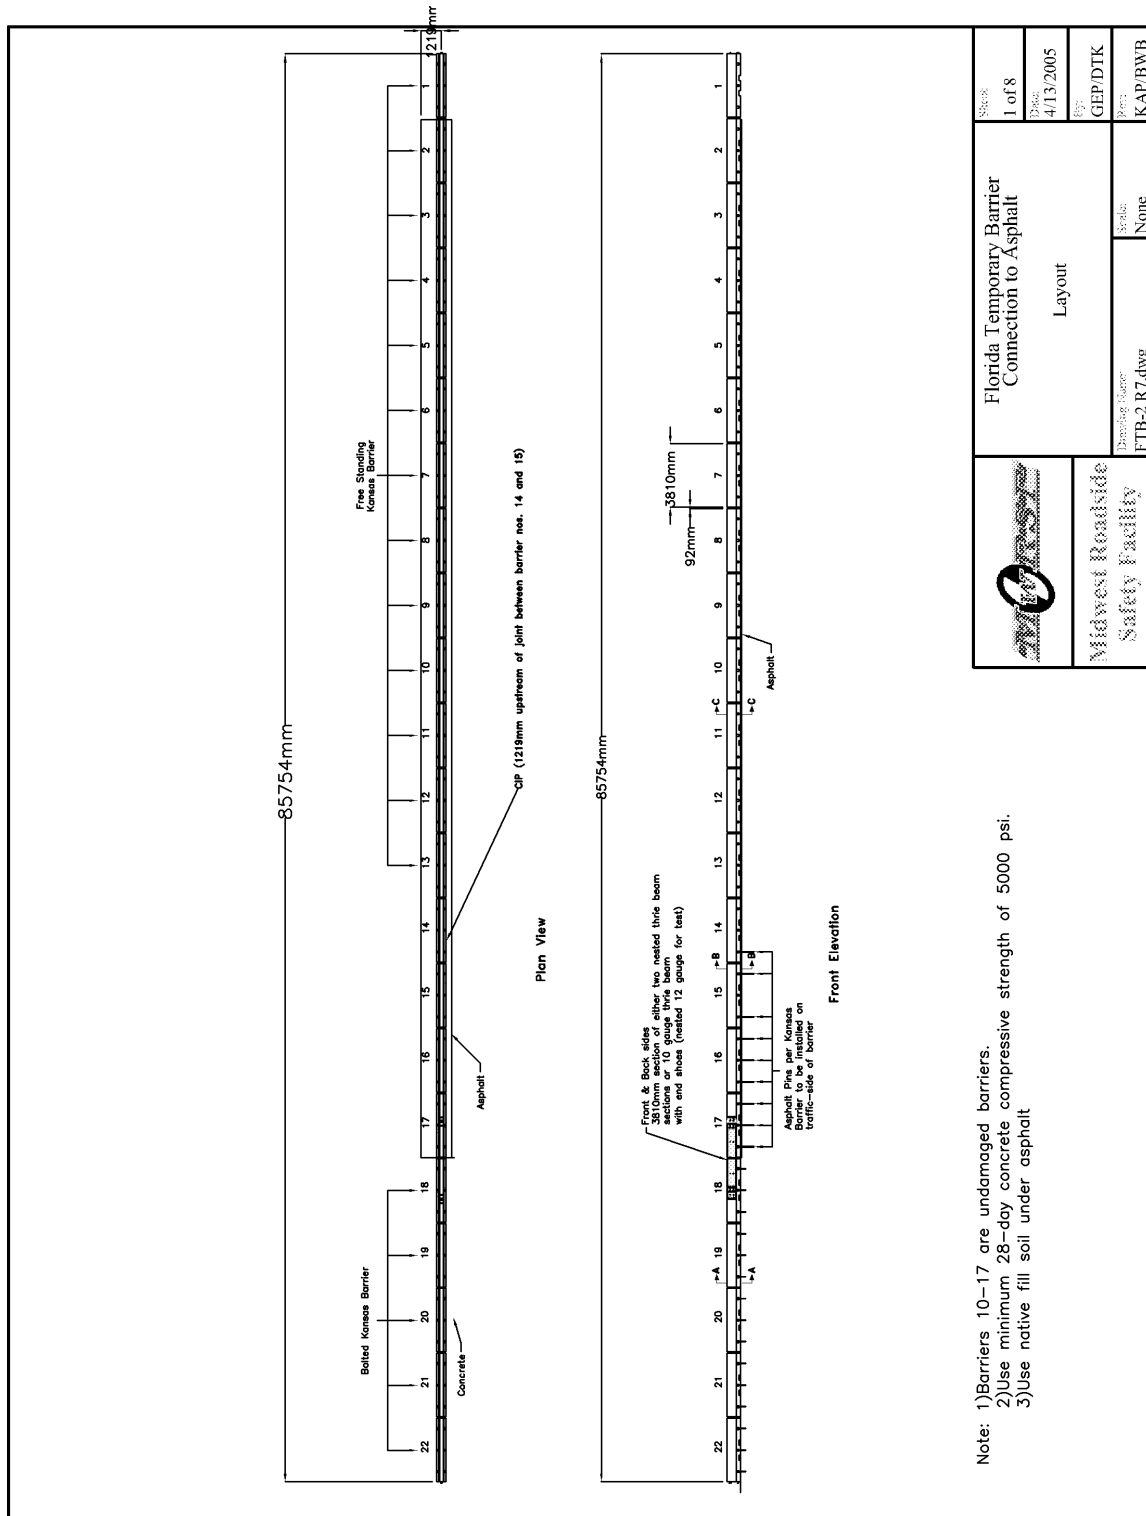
Free-Standing to Rigid Concrete Barrier Transition Details
